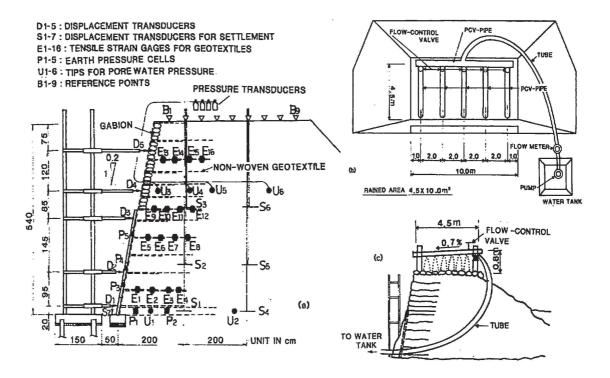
Kami-Onda test embankment; a) initial cross-section; b) plan; and c) configuration of rainfall test.
